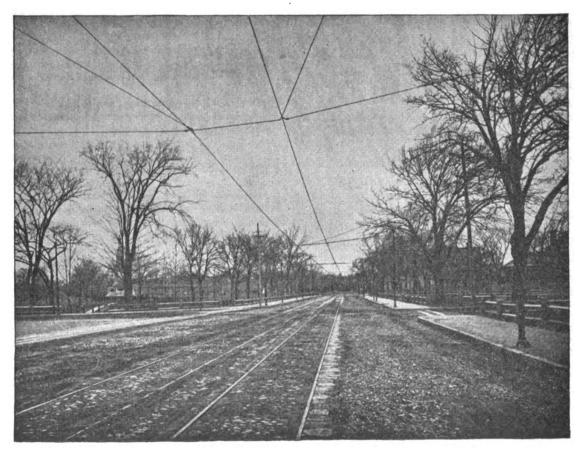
West End Street Railway, Boston, Cambridge Division.
